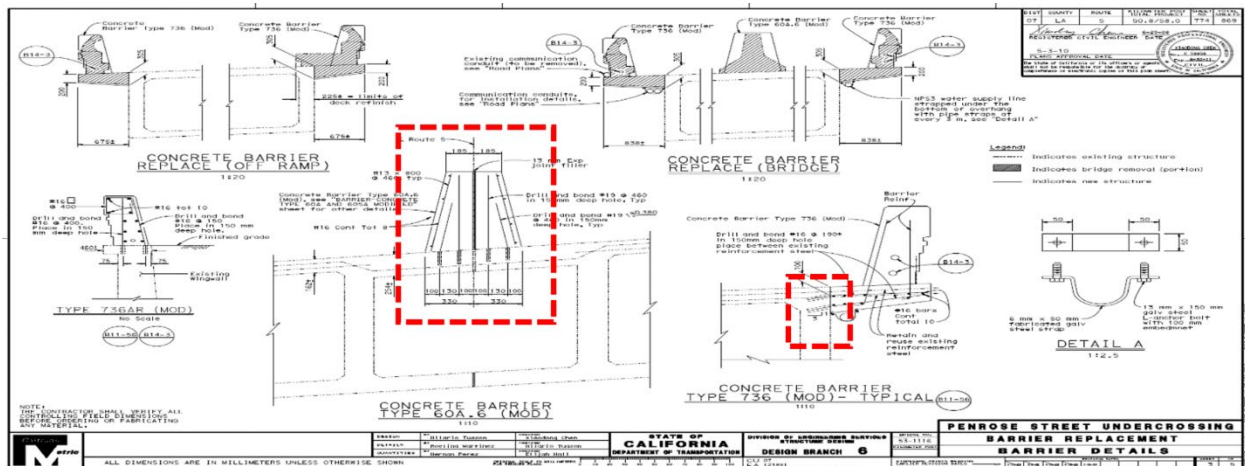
Drill and Bond Used for Construction of Barrier and Overhang
